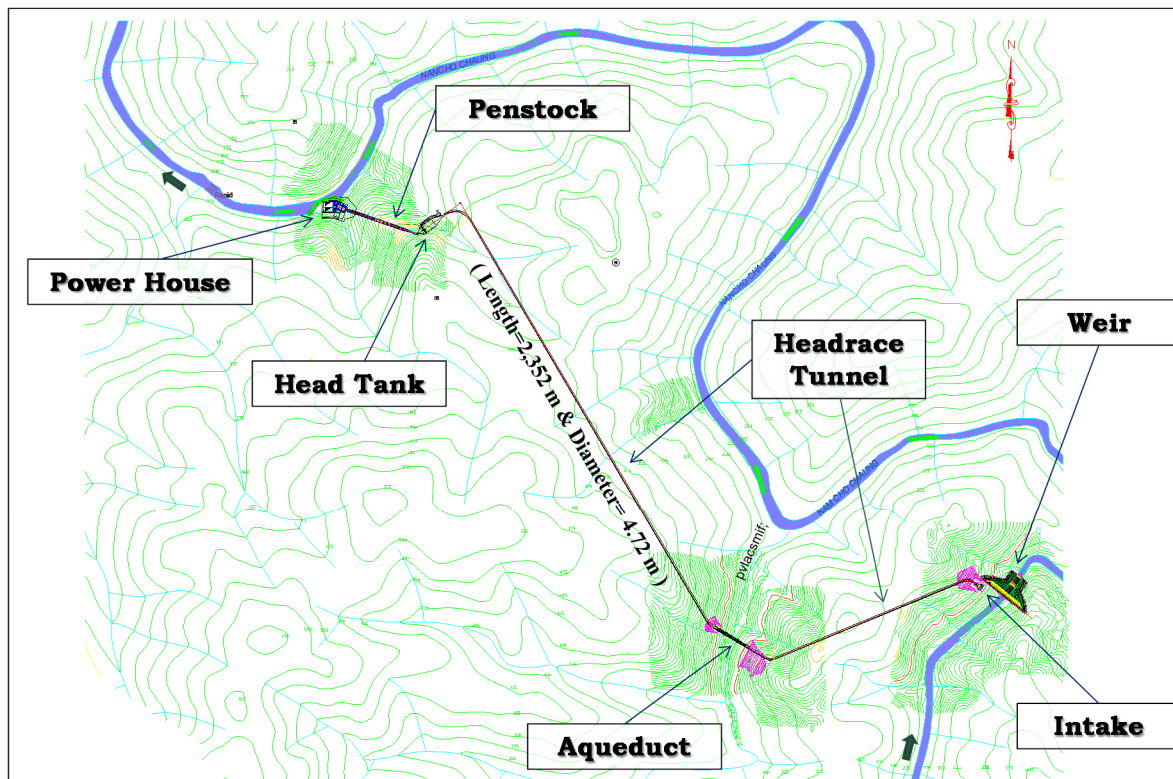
General Layout of Nancho Hydropower Project (Source: KEPCO, 2008)
